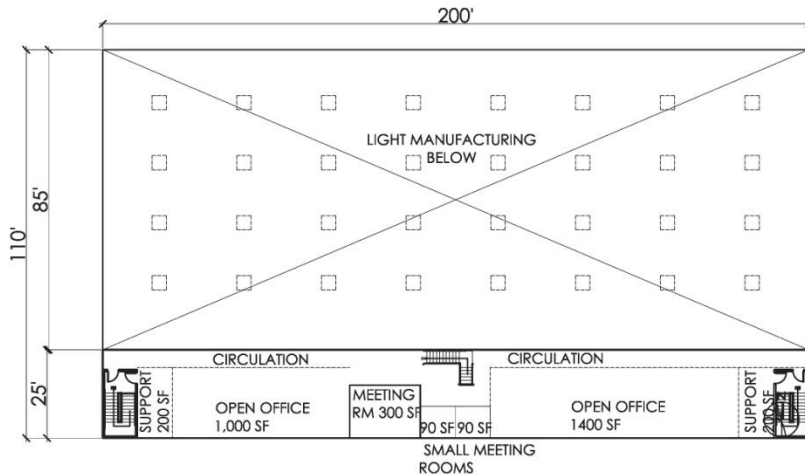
Net Zero ready office/manufacturing second floor plan
